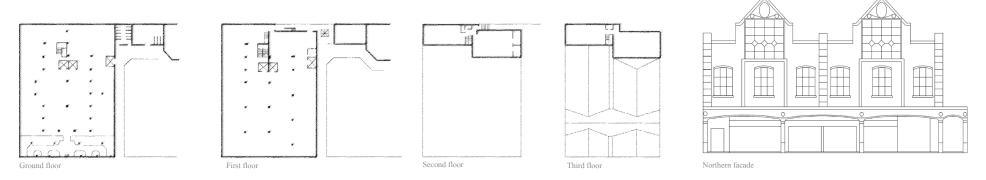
Building layout after alterations 1940- not to scale (GAP Architects, 2013 edited by Author)
